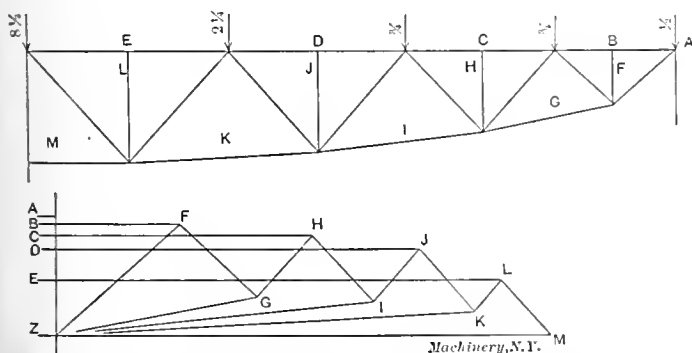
Length of Bays at End of Fish-bellied Girders Shortened to equalize Stresses in Struts
